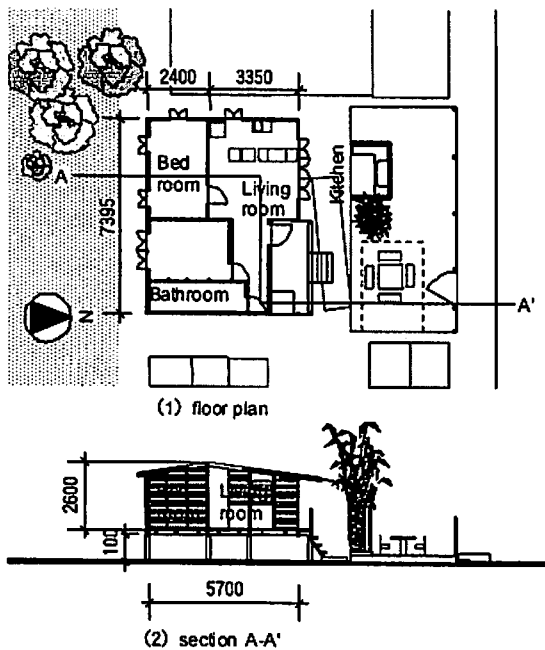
Plan and section of a house on the soil, B3 in Bangkok Noi area
